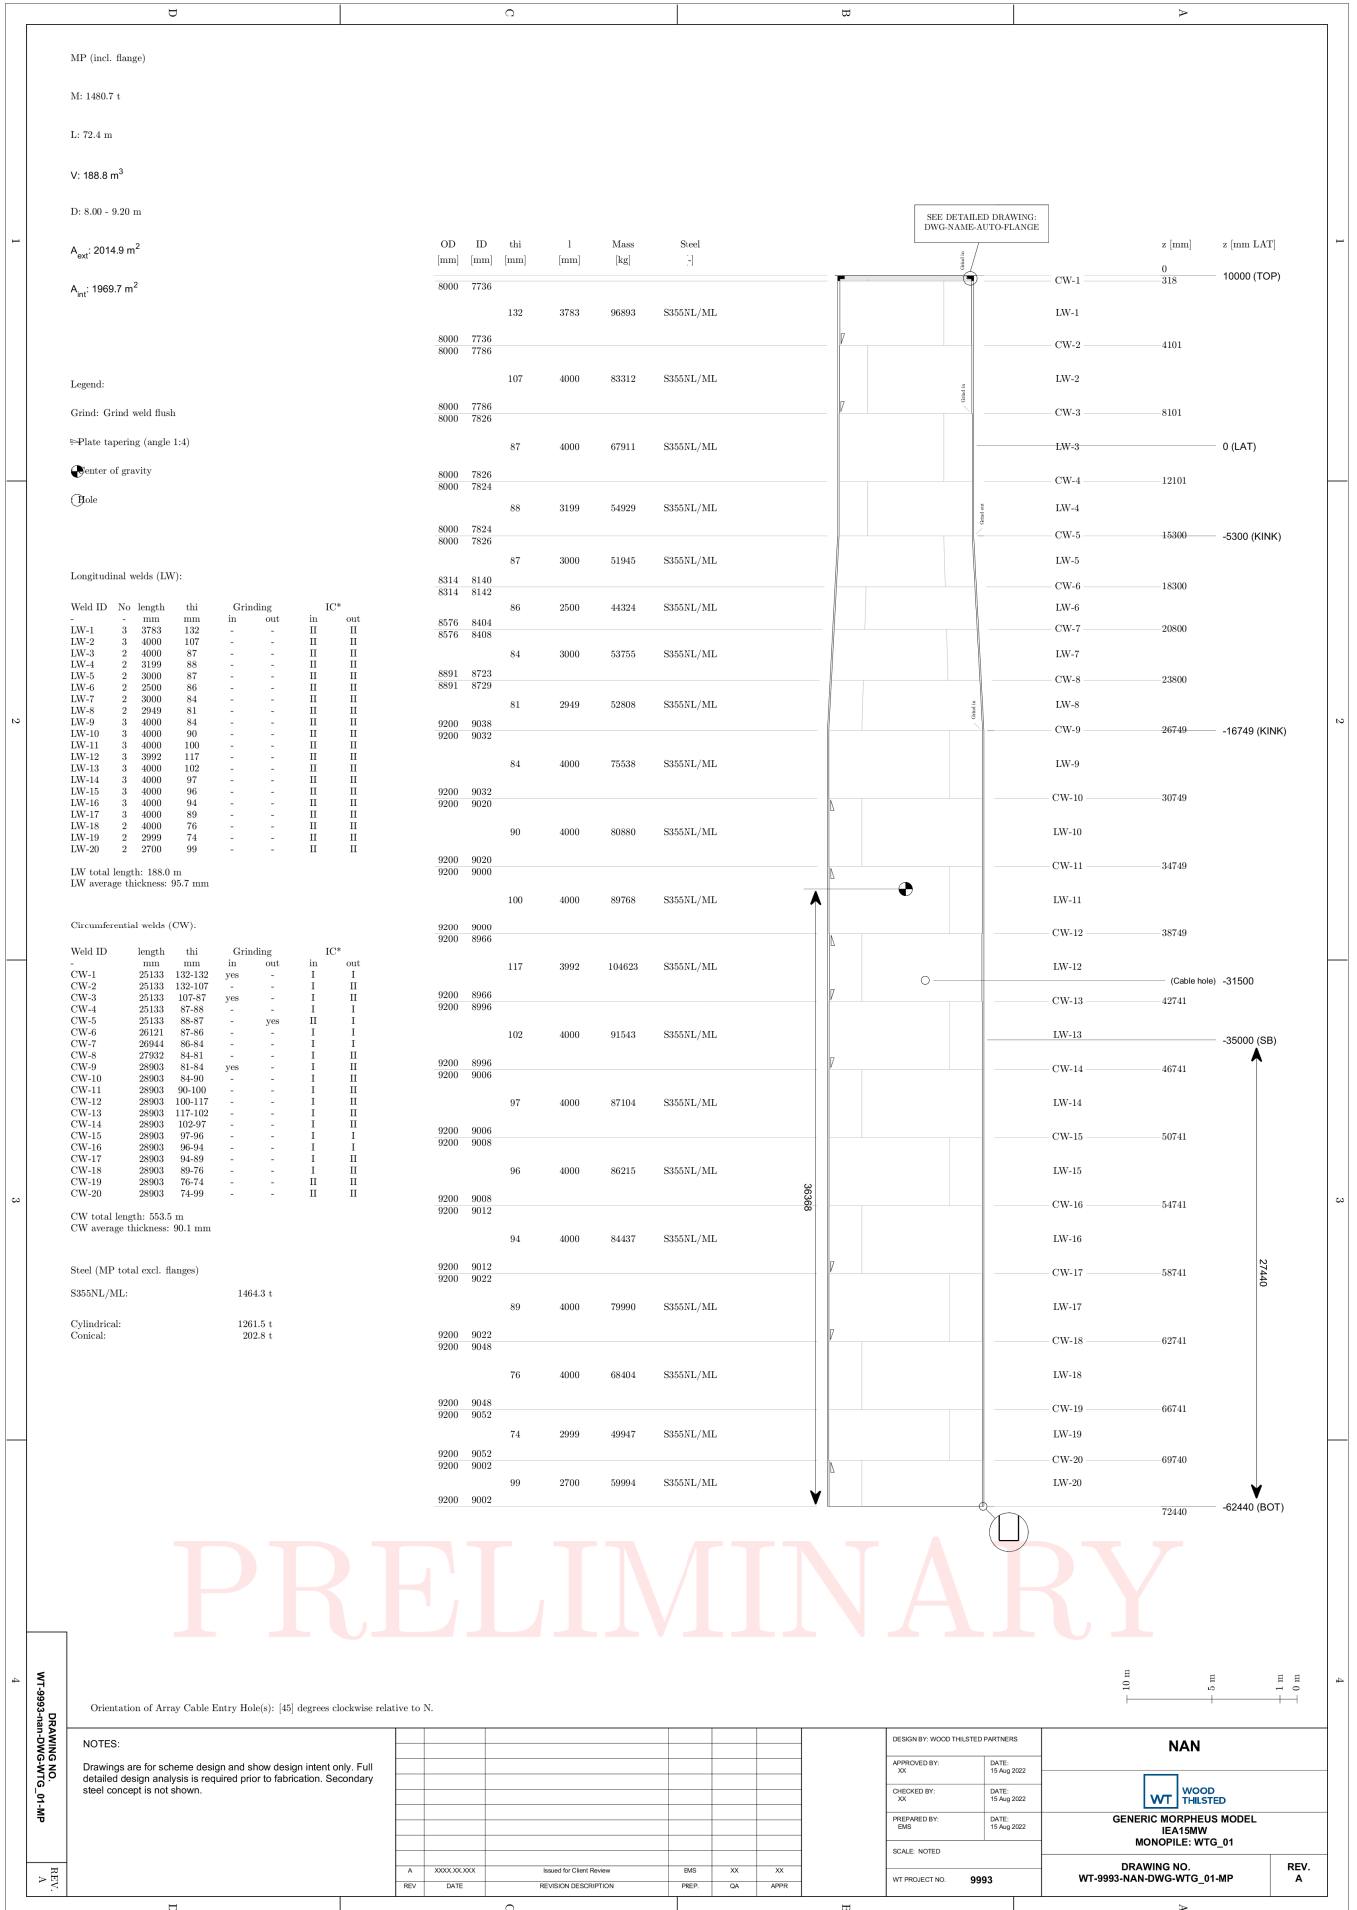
Monopile design drawing of relaxed case - Gulf of Finland
